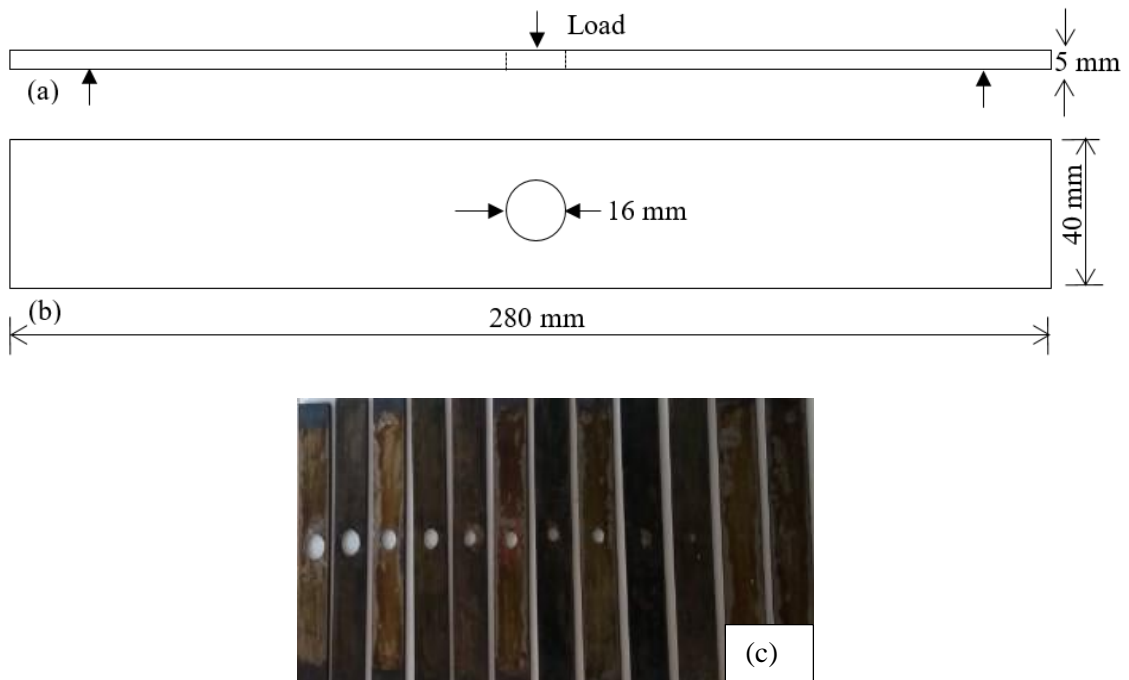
Schematic view of the conditioning steel element with non-strengthened CSH specimen (scale 1:2) (a) elevation (b) plane view (c) typical test specimen
